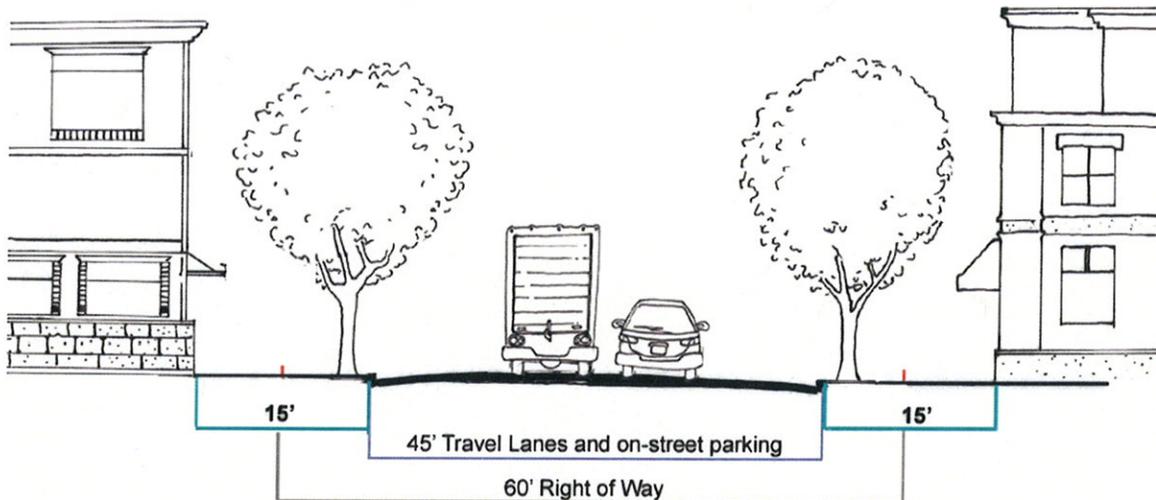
Lithia Way at Second St. Redevelopment under Proposed Arterial Setback Revision
